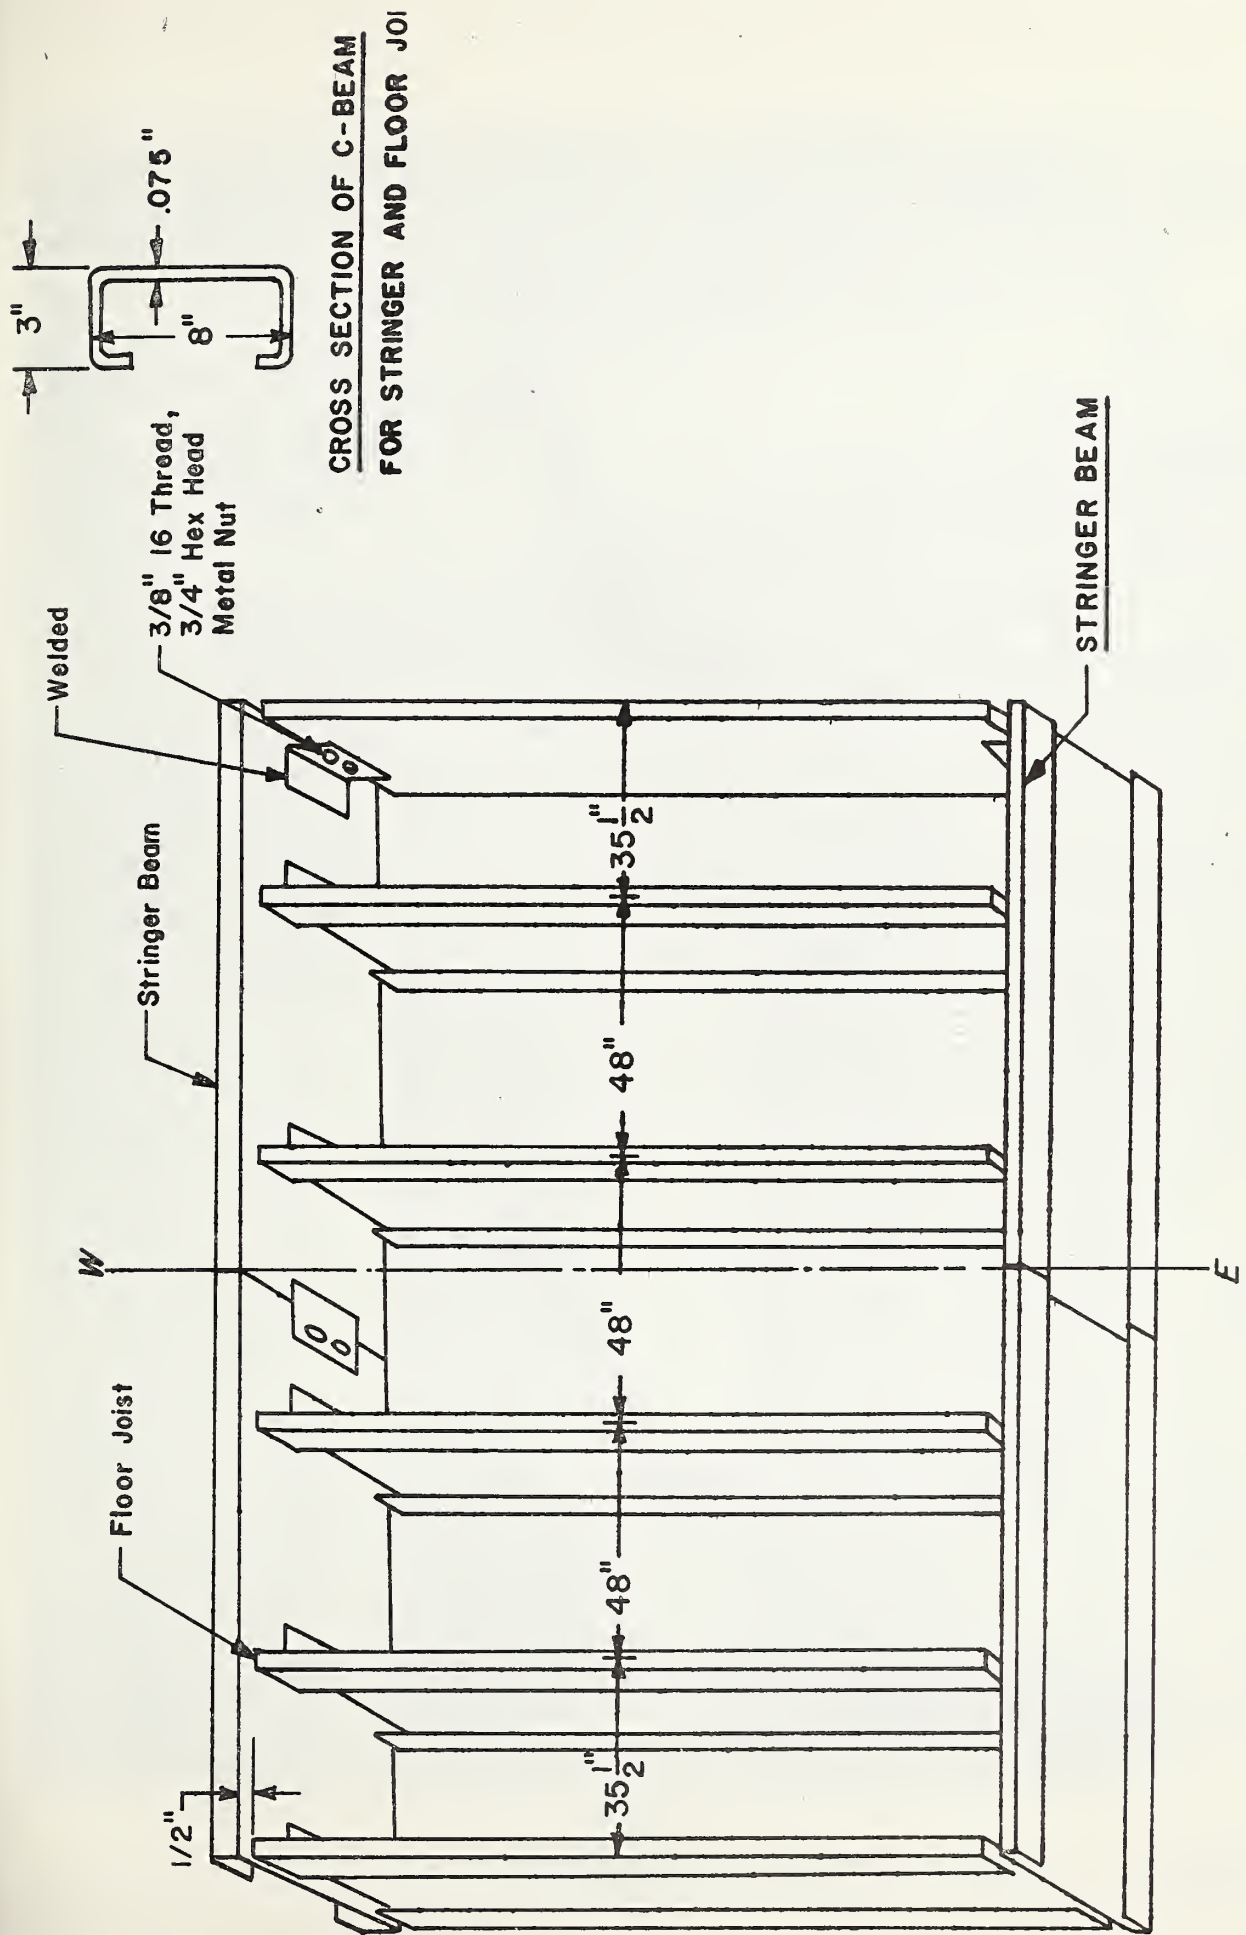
Structure of Stringer Beams and Floor Beams (Joists)
